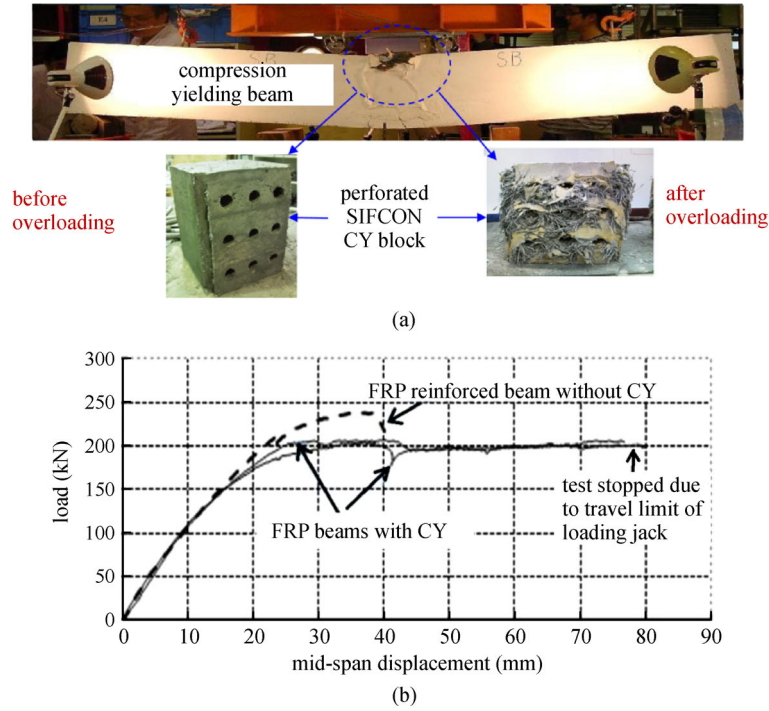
Compression yielding structural system. (a) CY block cast into an RC beam; (b) test results of CY beams.
